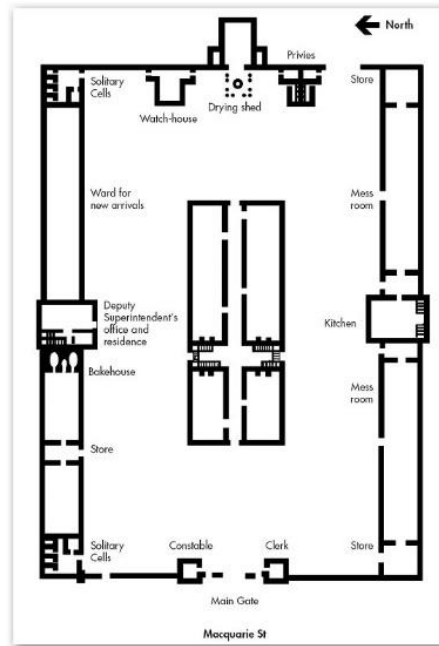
HPB Floor Plan 1819-1848.⁴⁴⁸
